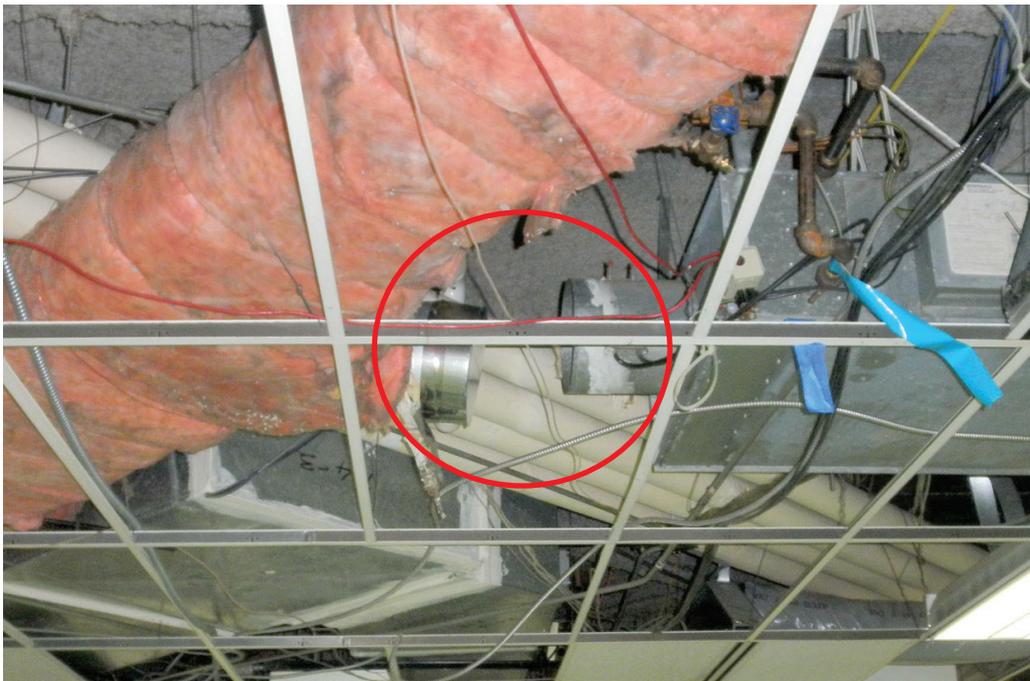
Ceiling and duct damage. The duct separated from the in-line HVAC unit to the right.
